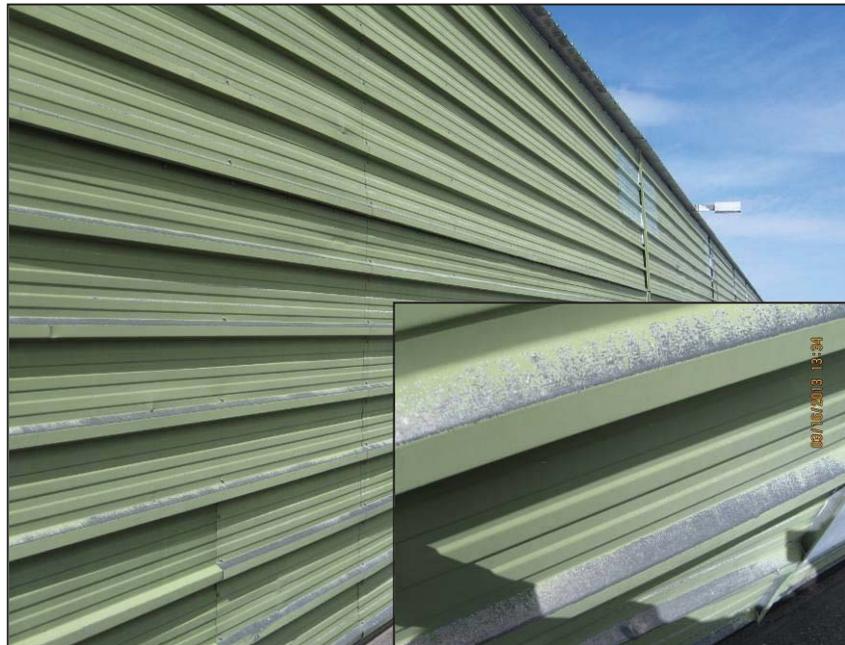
shows the condition of the siding on the southeast façade of Hangars A and B. Note the exposed galvanized steel.
